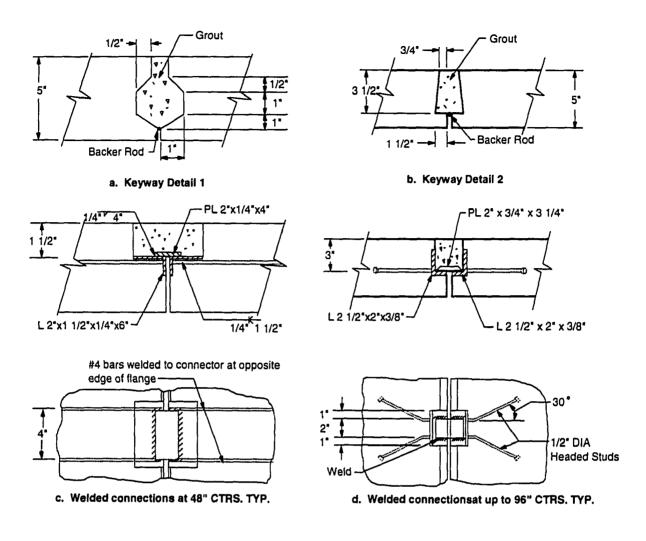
Typical flange connection detail used by Concrete Technology Corporation and by Central Premix Concrete Company.
